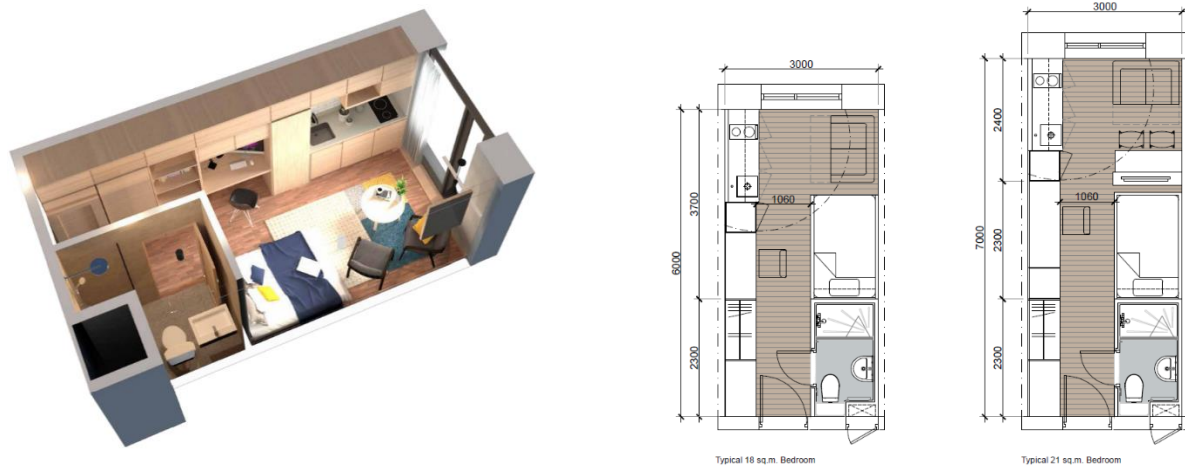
Typical Layout of a Shared Accommodation Floorplan
